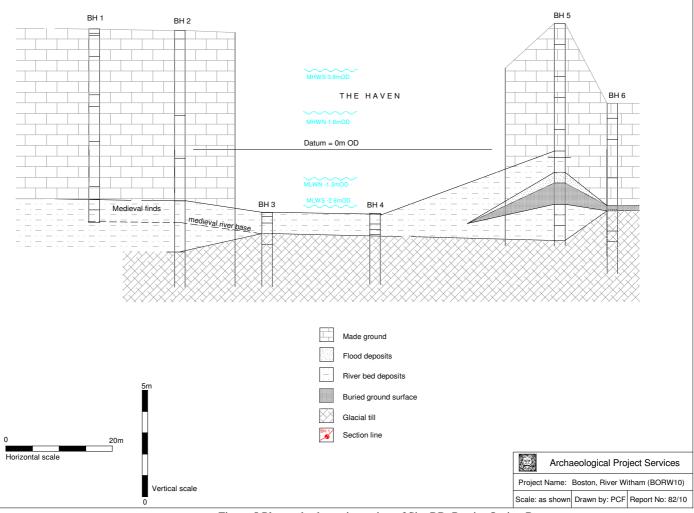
Plan and schematic section of Site BB, Barrier Option B
